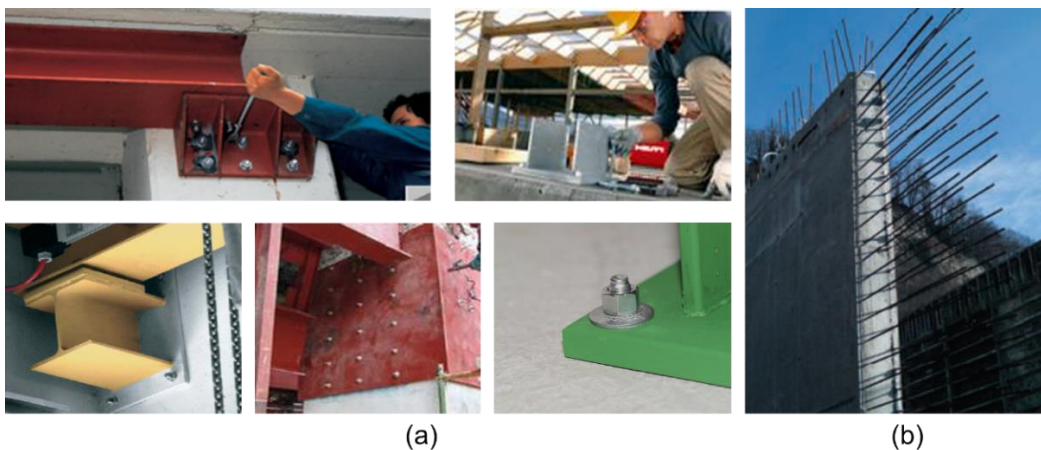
Typical structural applications for (a) post-installed anchors, and (b) post-installed rebars
